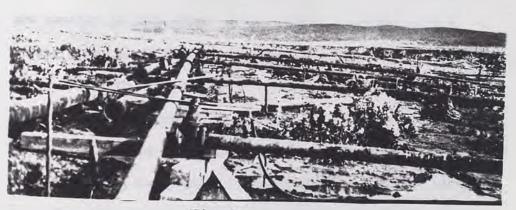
field illustrating flange feeder line. Tote 6 inch commented between flange feeder and header pipe.
